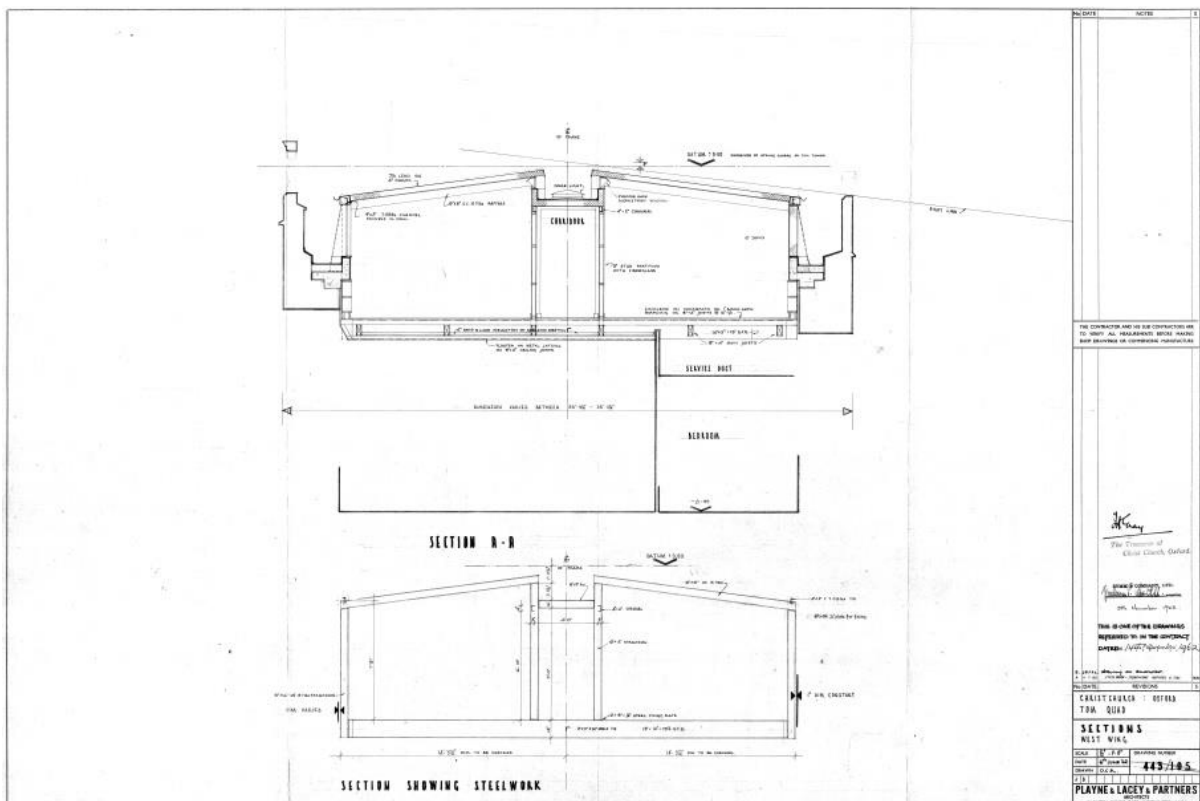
Playne and Lacey drawing 433/105, dated 6 June 1962, showing cross-sections of the new roof structure and associated steelwork in Bachelor’s Row.
